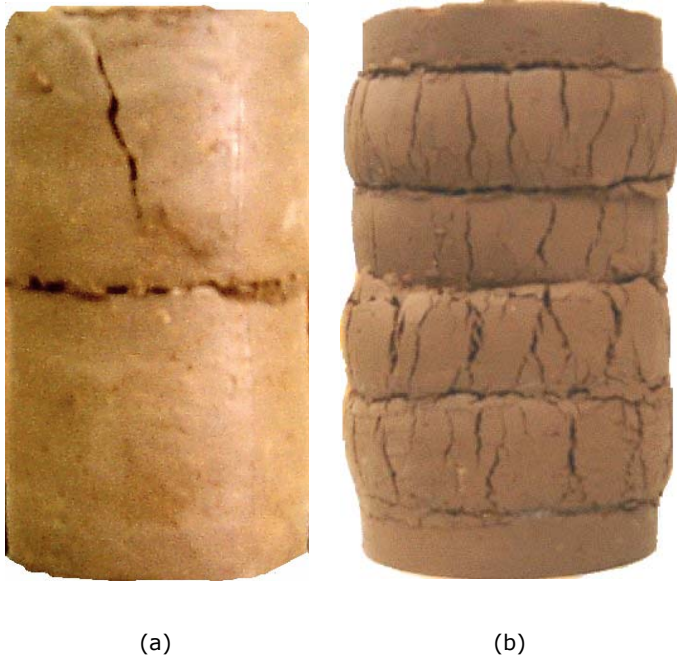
Typical specimens of soil reinforced with (a) one and (b) five geotextile layers after triaxial compression testing
